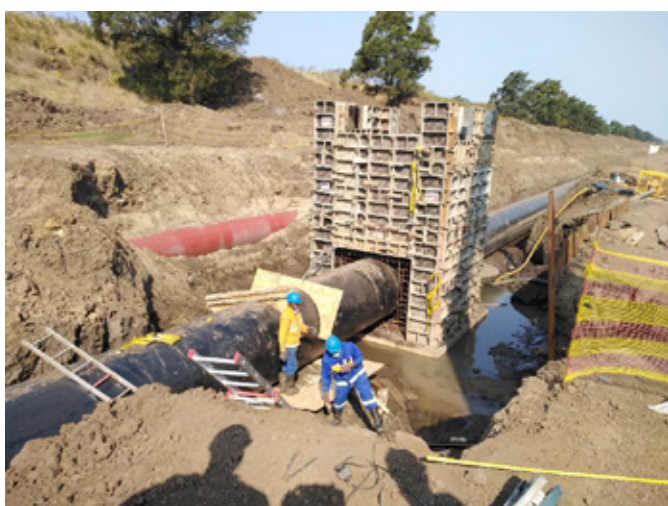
Nsezi Pipeline - EME's assisting with fixing of formwork prior to the concrete pour.
